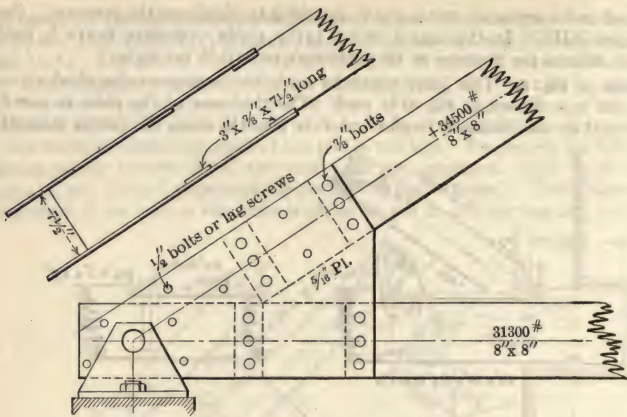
Detail of Joint 1, of Truss Similar to Fig. 1
